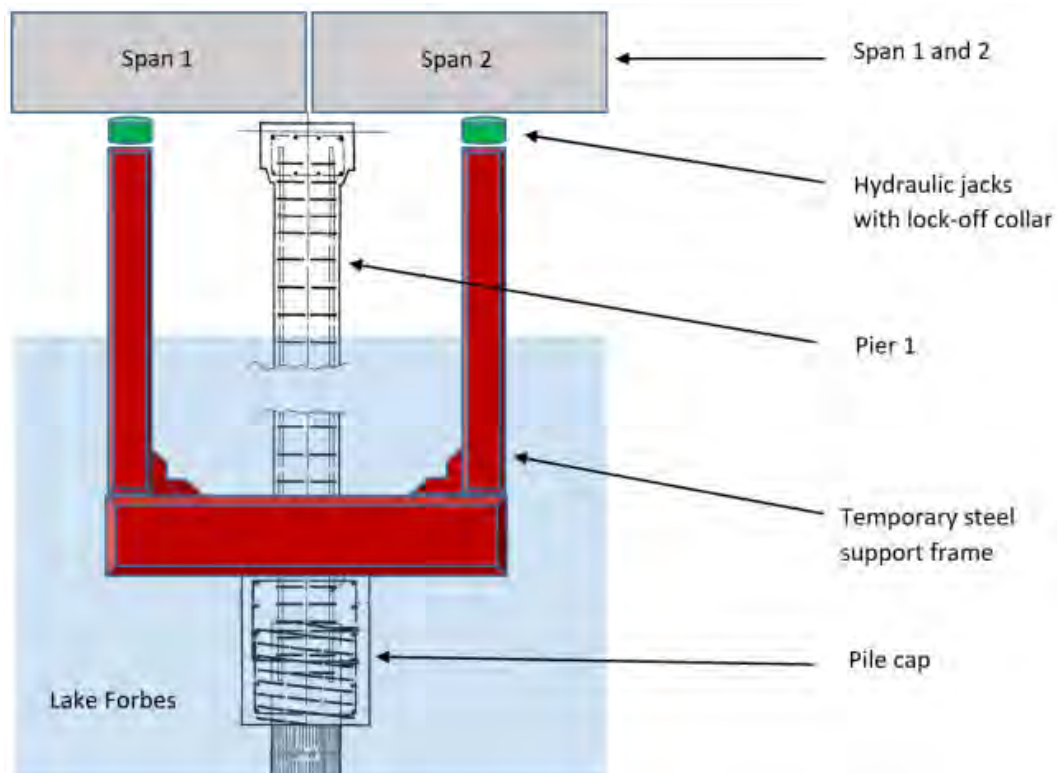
Typical temporary support frame to rehabilitate or replace piers (Source: FBE)
